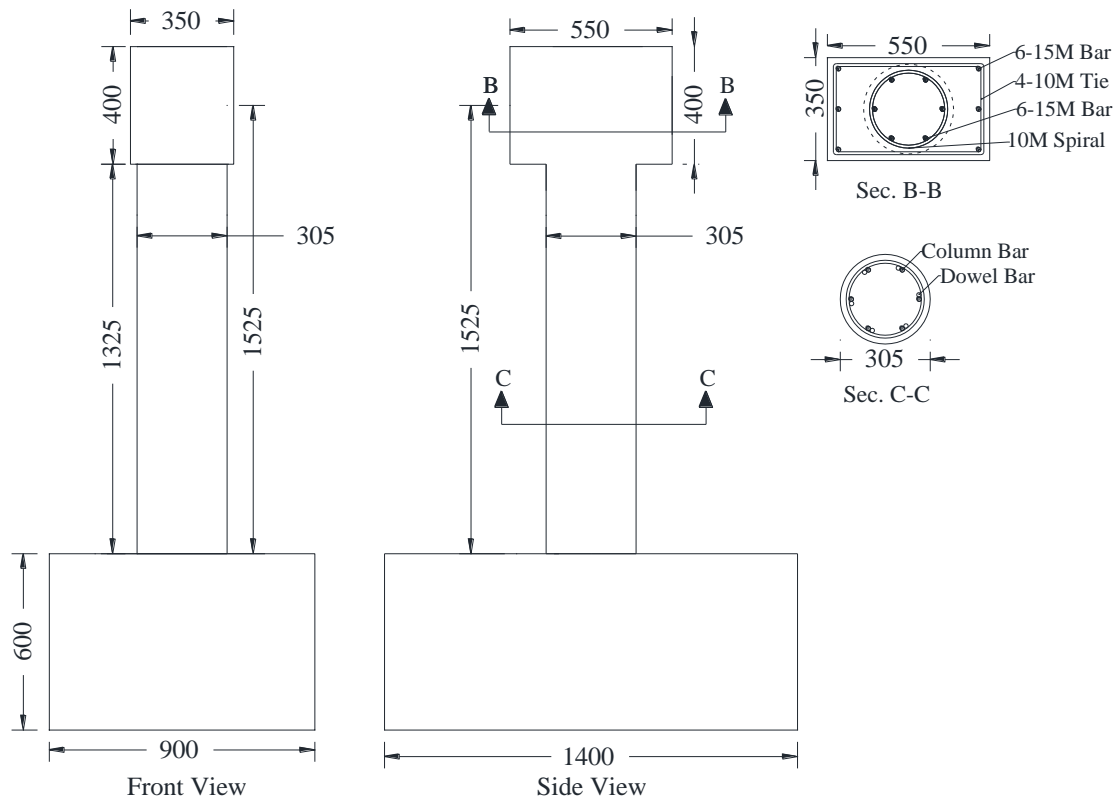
Typical dimensions of test specimen (all dimensions in mm)
